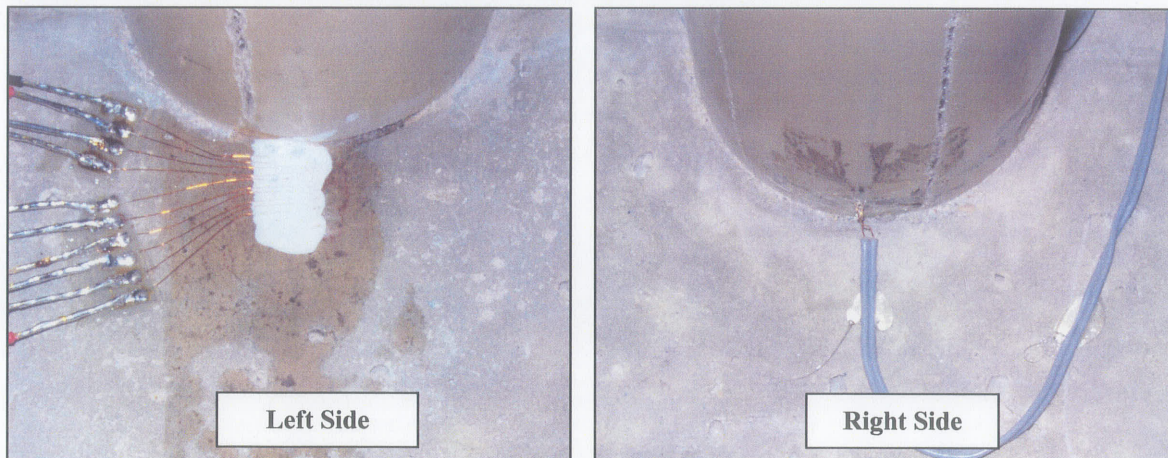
(a): Concrete below 50.8-mm concrete-filled GFRP dowel after failure (55 kN) – Phase II – No visible damage to concrete
